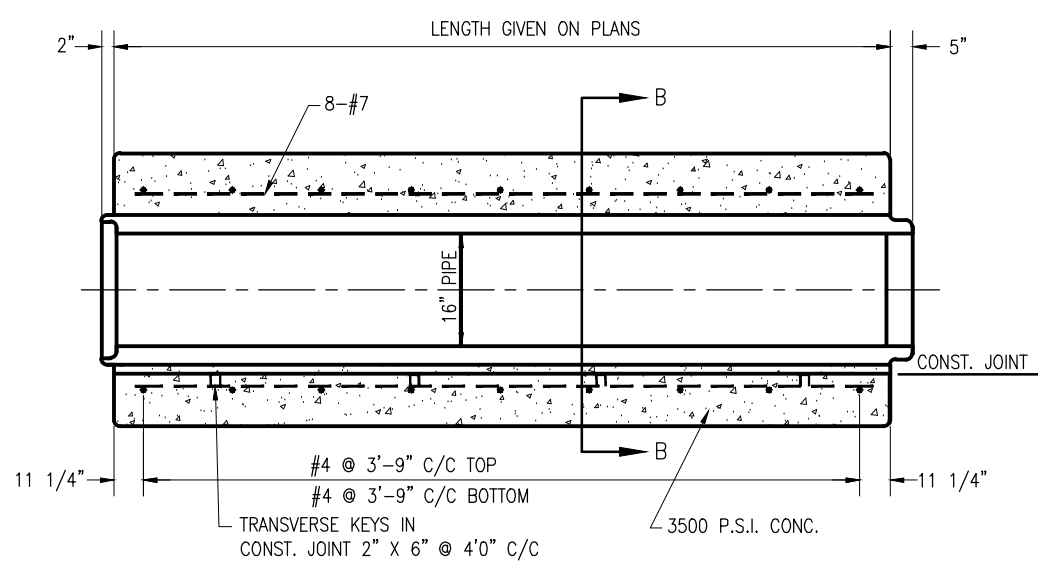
DETAILS ARE TYPICAL FOR WATER MAIN CONSTRUCTED IN CASING PIPE.
